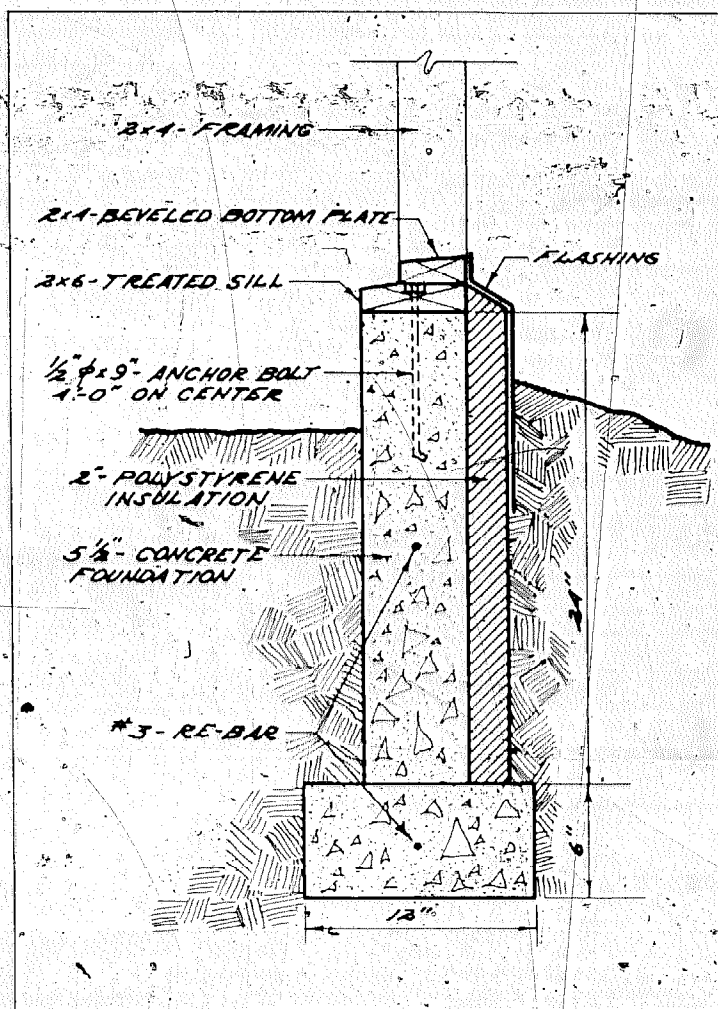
A Poured concrete footing and foundation wall (shown with insulation on the outside)
